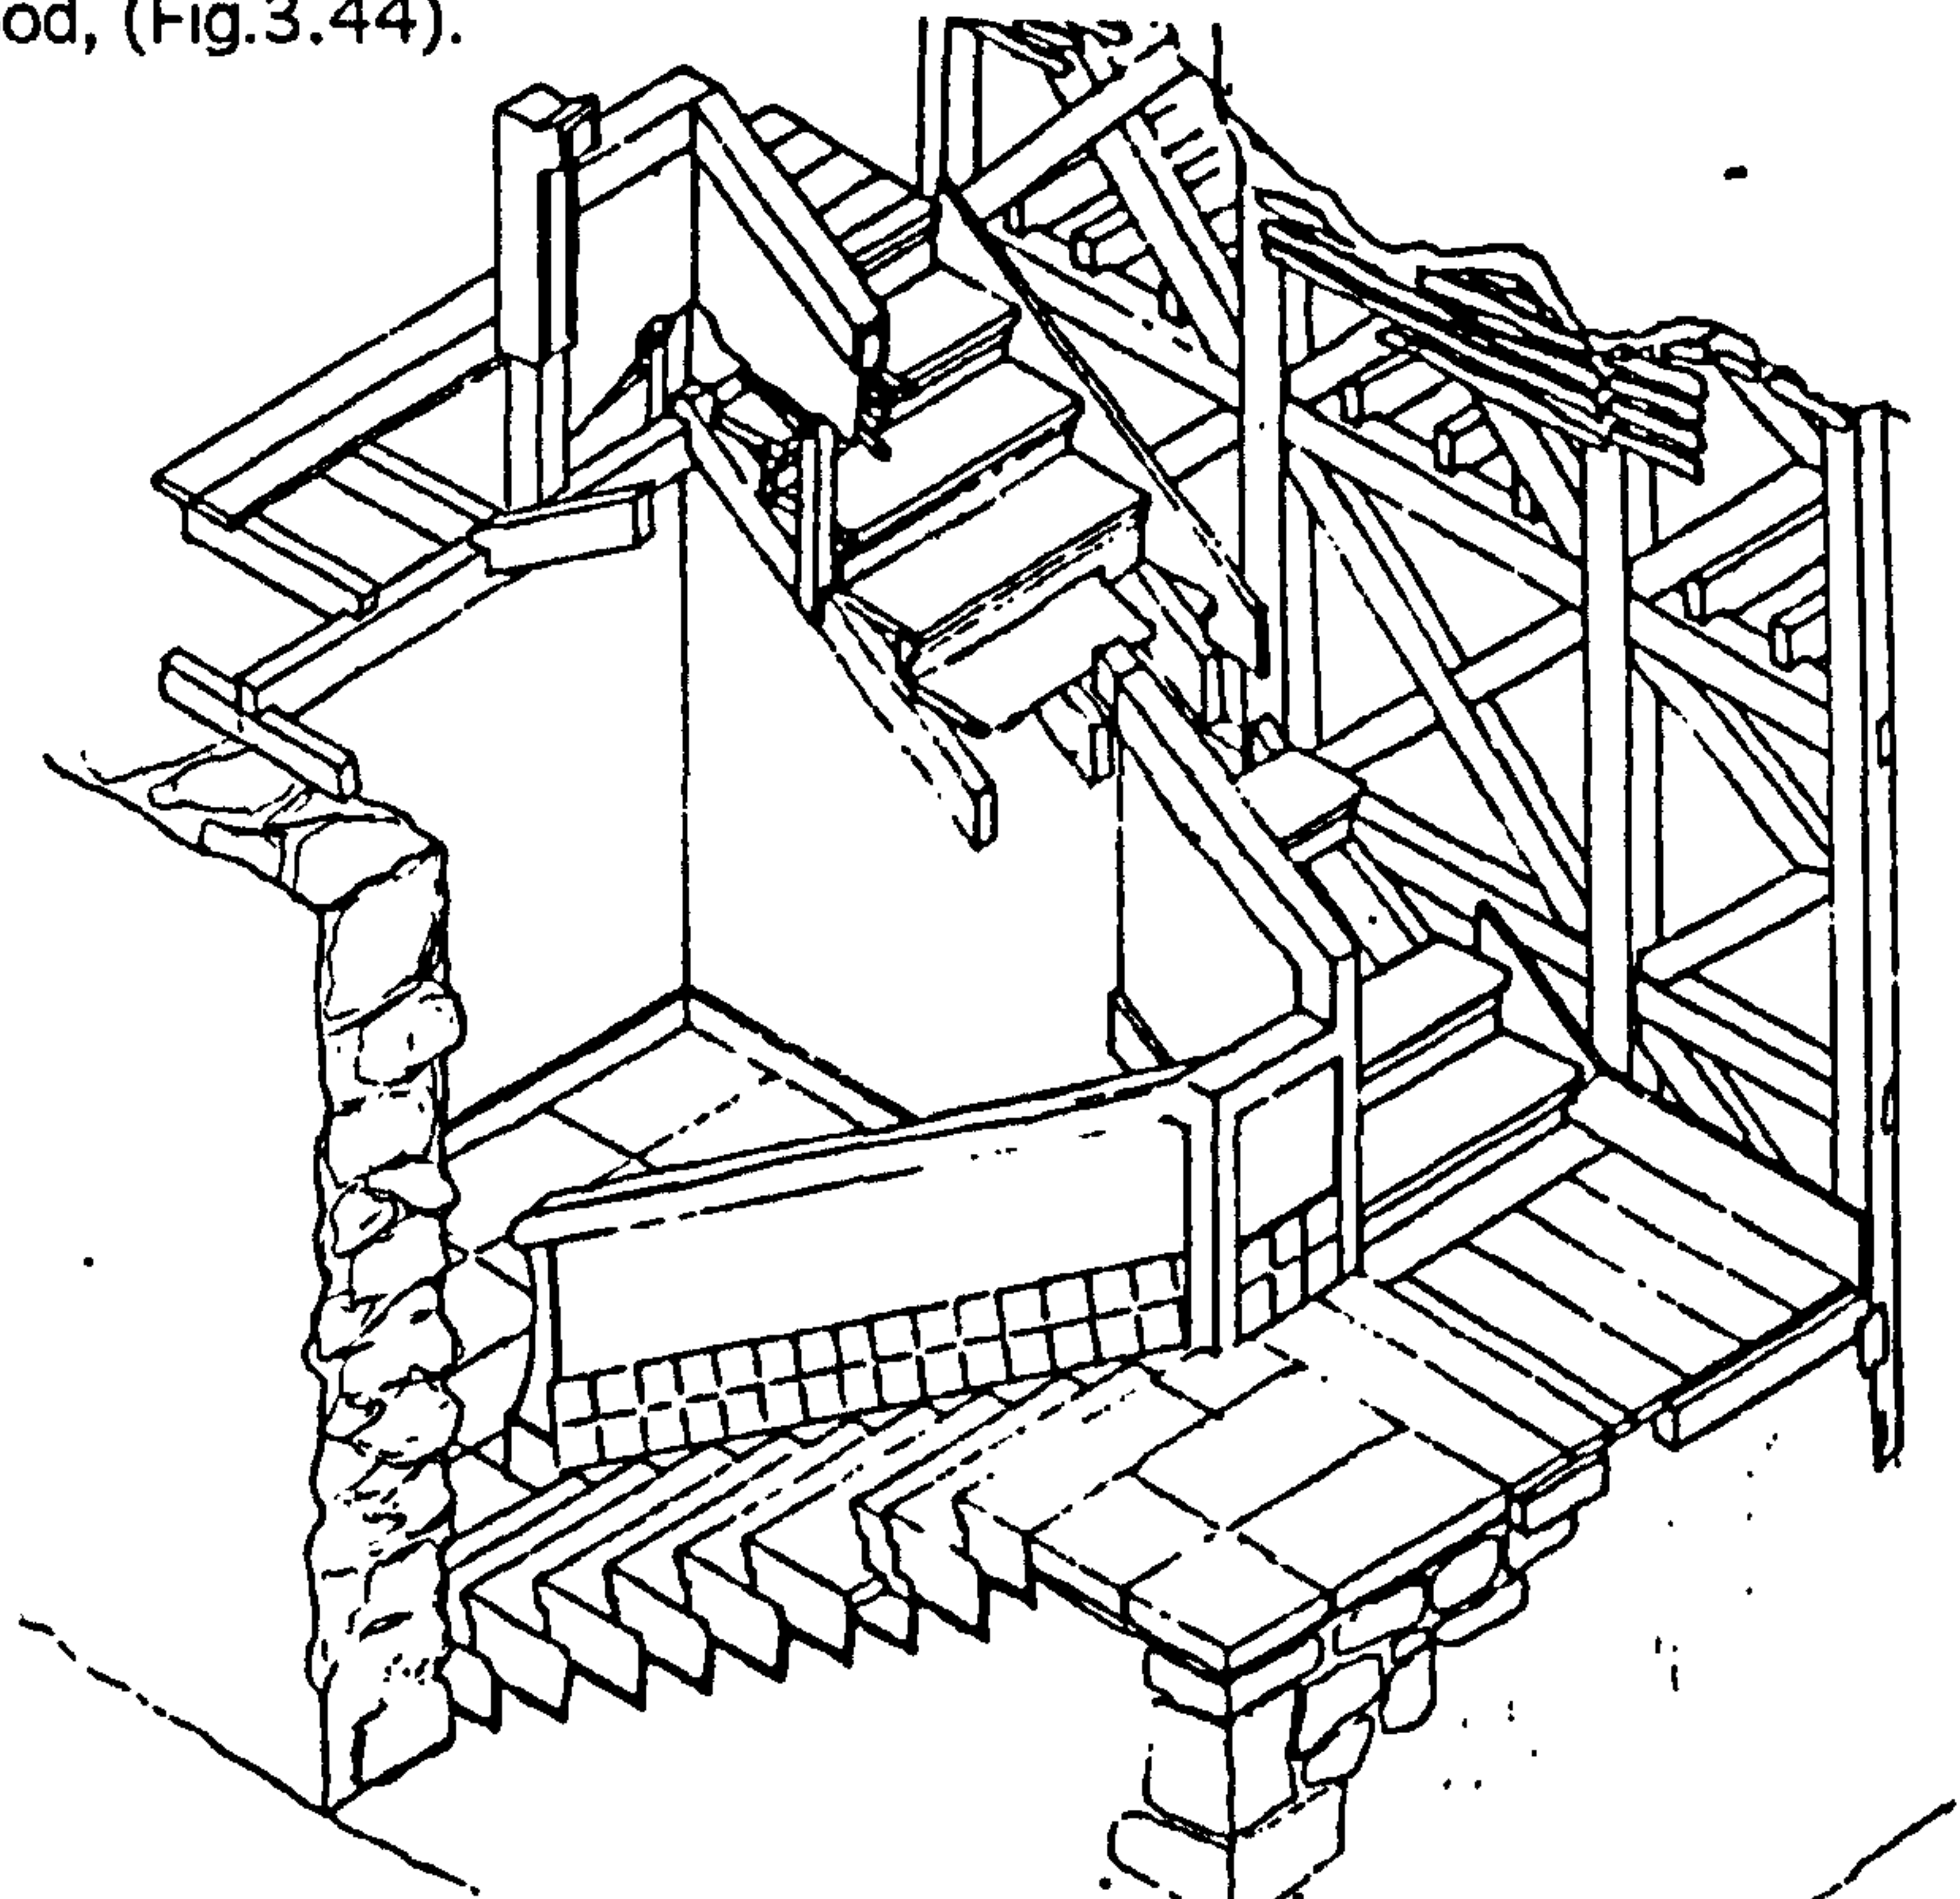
Cut-away isometric of ground floor staircase: construction detail.
